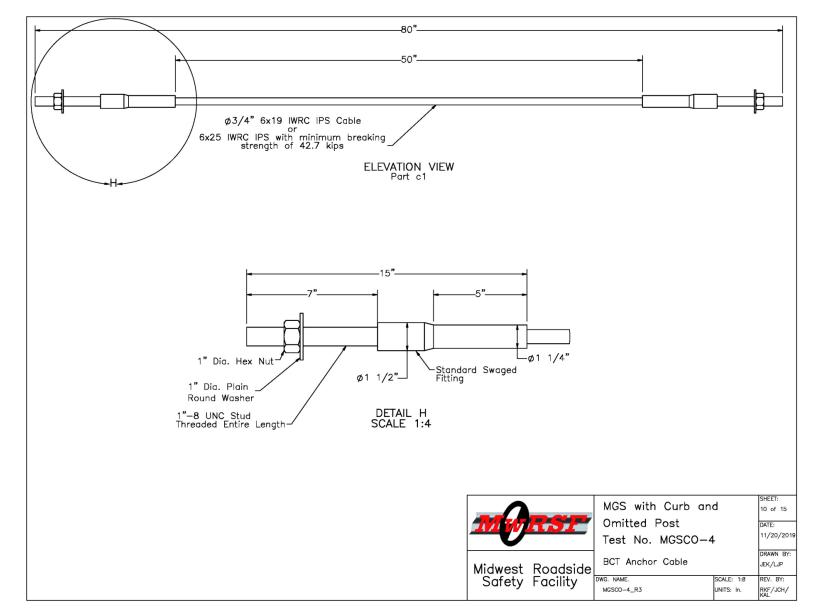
MGS BCT Anchor Cable, Test No. MGSCO-4
